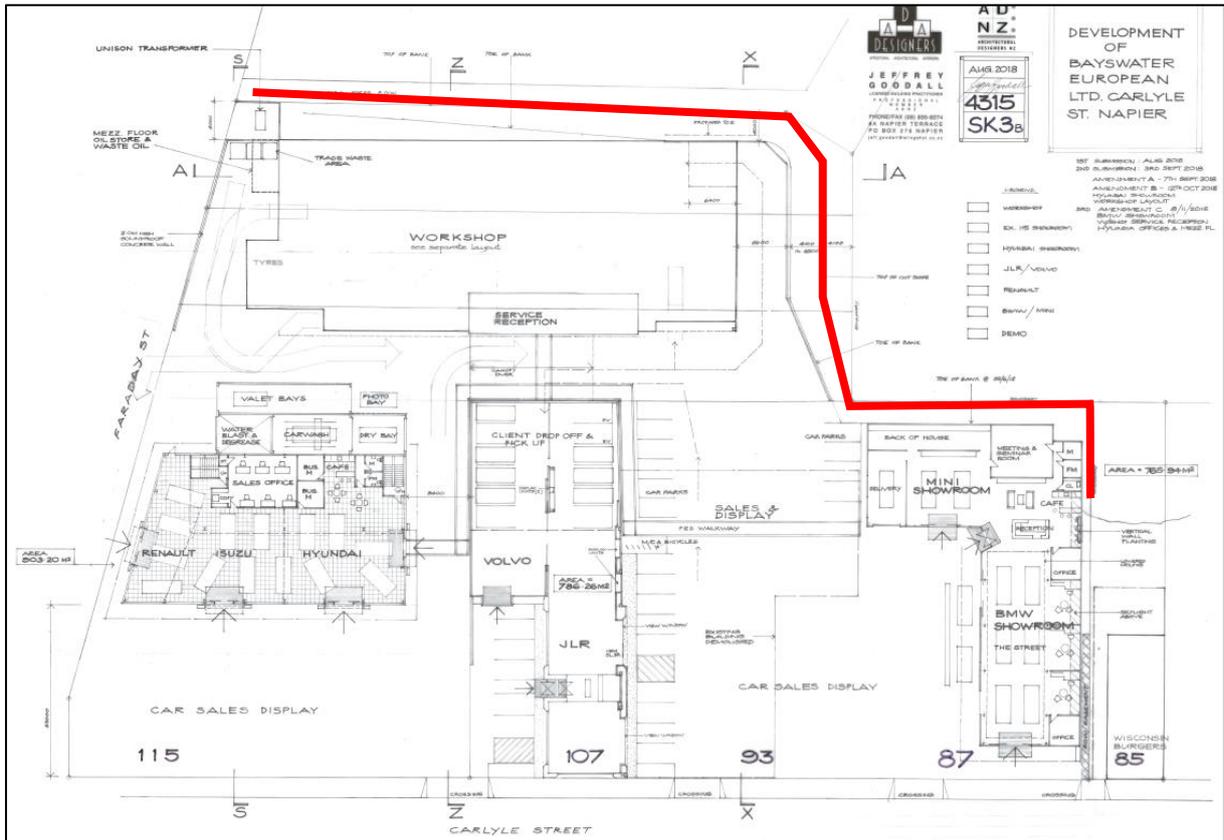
Site Plan – ADA Designers (Indicative location of cut face in RED)
